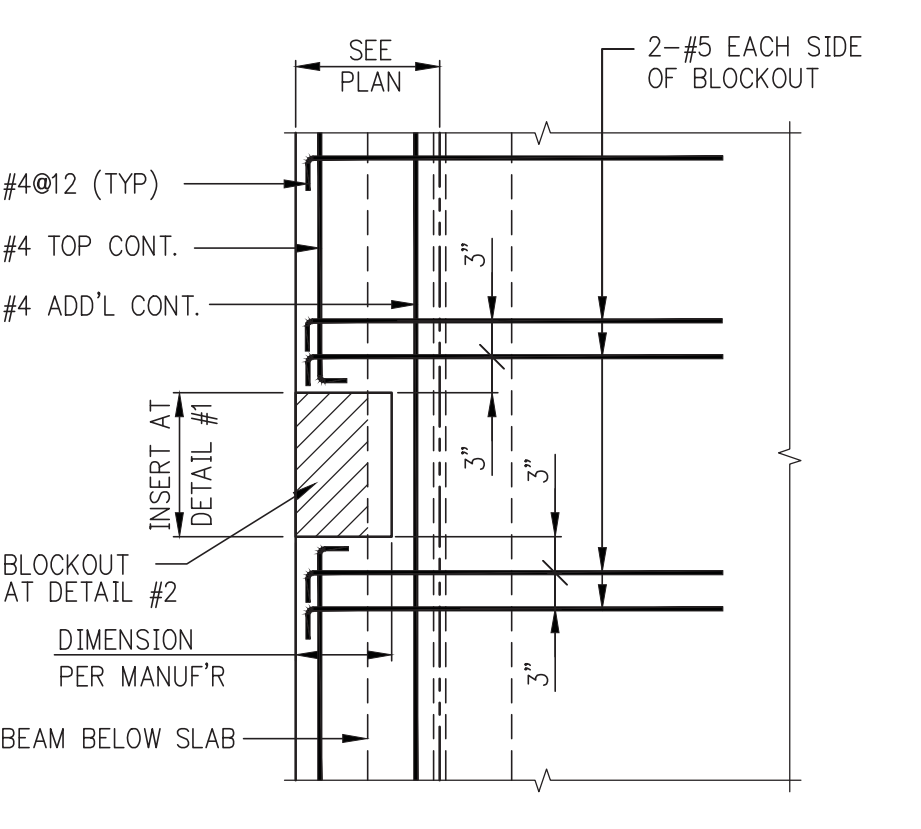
(WHERE FACADE ANCHOR IS EMBEDDED INTO SLAB) (REBAR TO BE COORDINATED WITH INSERT LOCATION)
